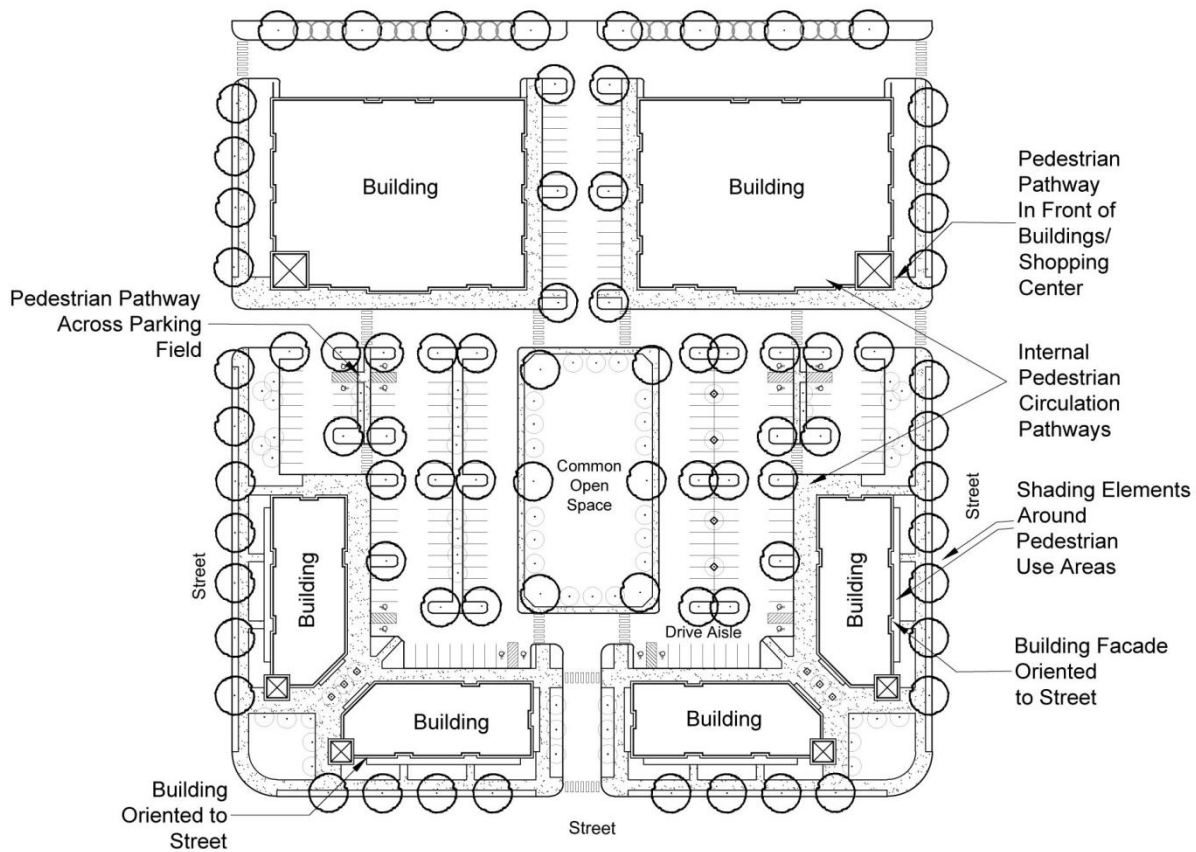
(d). – Site Layout – Pedestrian Design Standards
